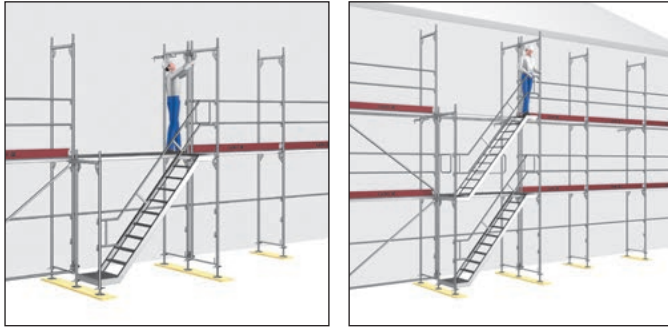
Connection to main scaffolding Fig. 66: Installation of stairway guardrail
